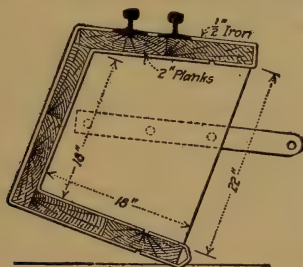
Section Through Bucket Used on Electric Drag Scraper.
